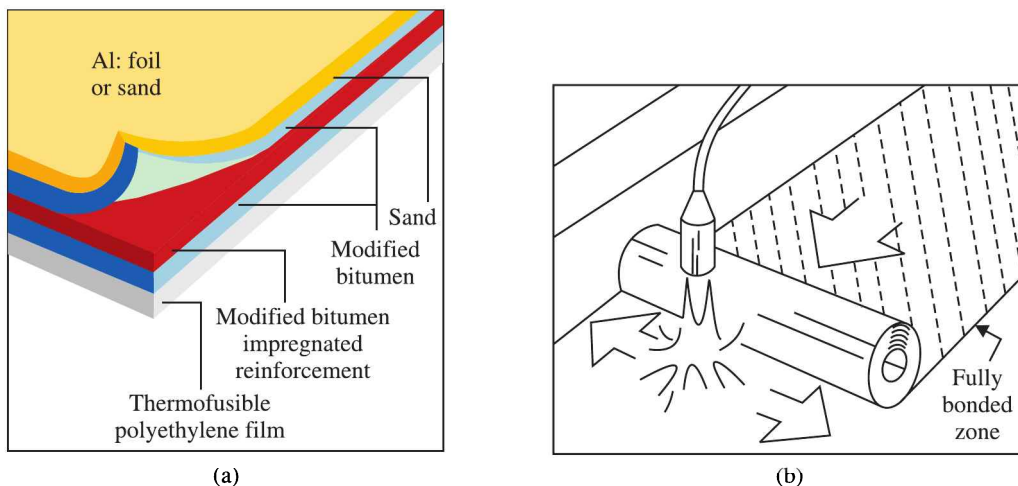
Manufacture and installation of bituminous sheets for waterproofing: (a) Modern waterproofing membrane with modified bitumen. (b) Bonding of waterproofing membrane to separate roof by torching.
